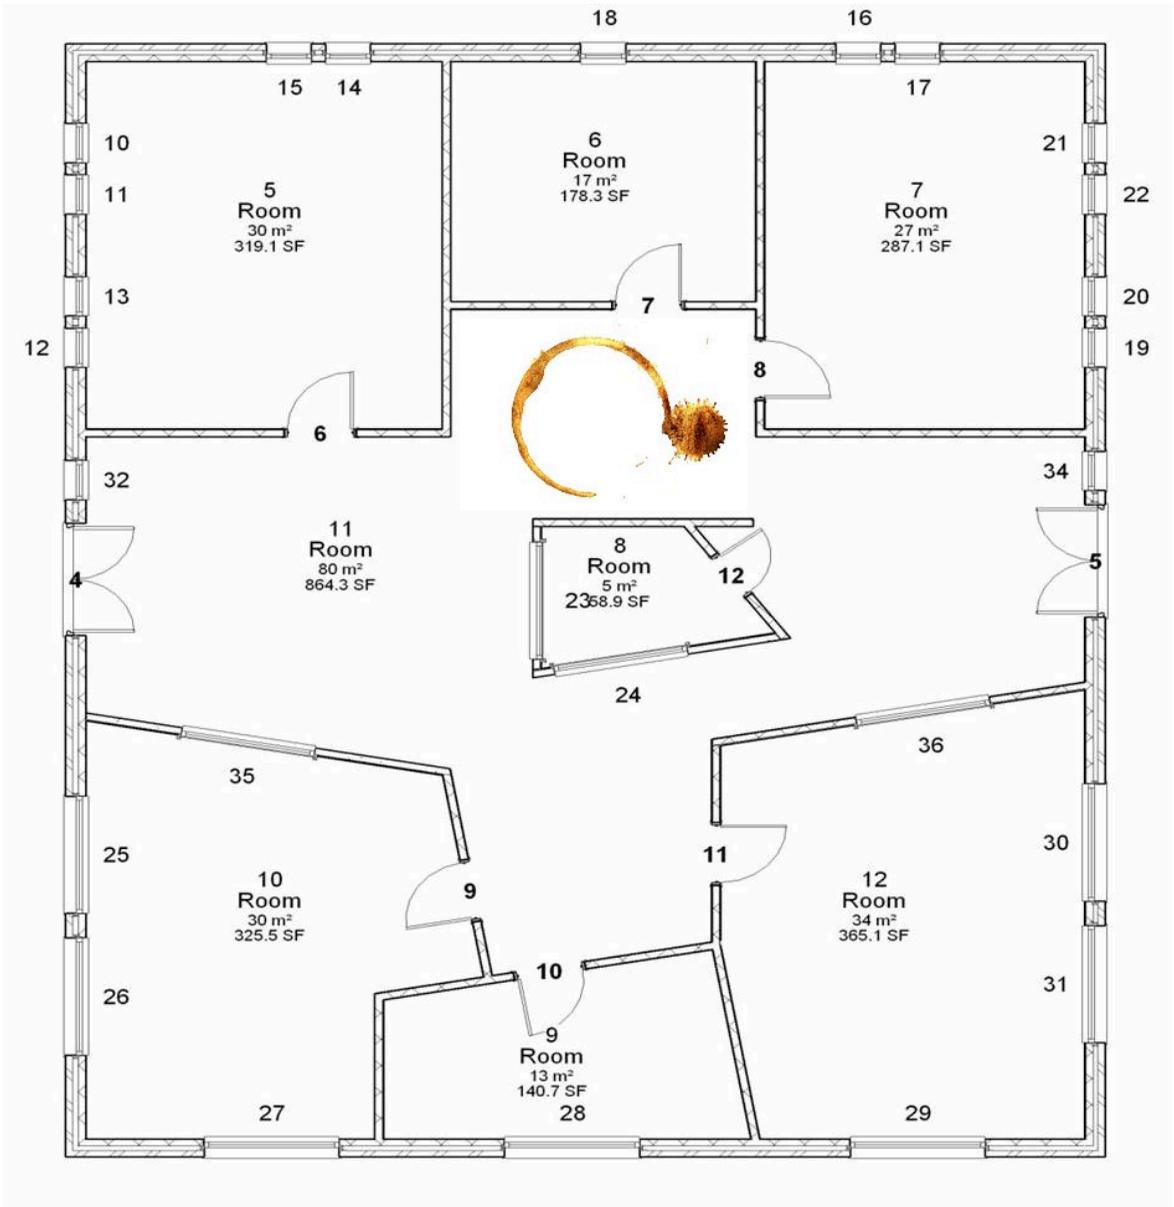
A new state of the floor plan: the coffee stain is neither well-formed nor meaningful in the framework of a line drawing
